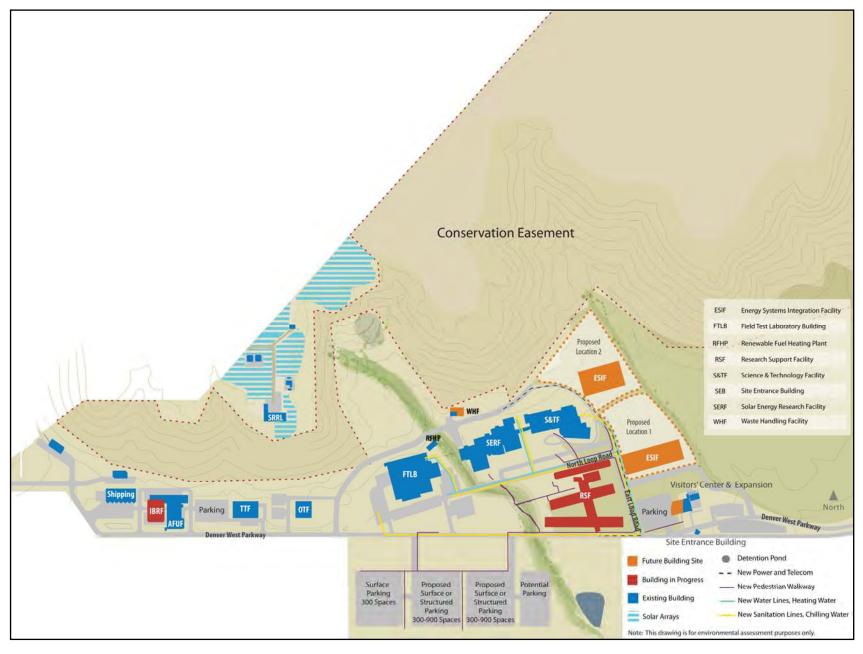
On-site Locations of Proposed Buildings and Upgrades
